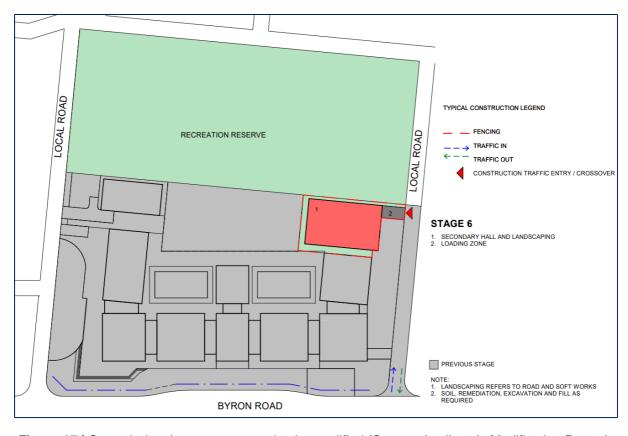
| Stage 6 site plan – as proposed to be modified (Source: Applicant's Modification Report)
